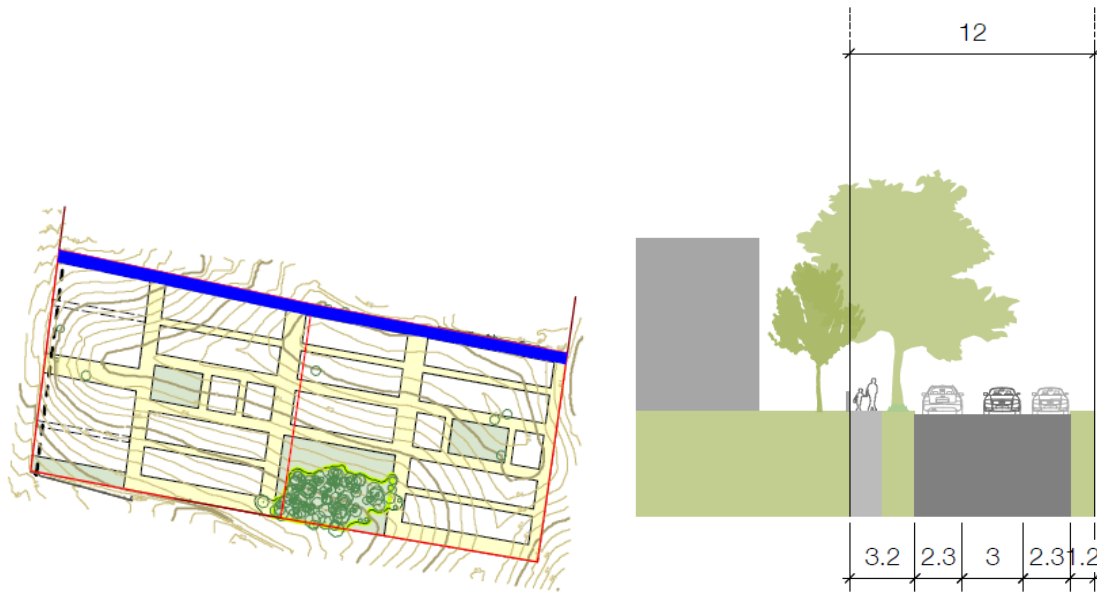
12m Wide Road – Existing Laneway Upgrade (Hills Thalys)
